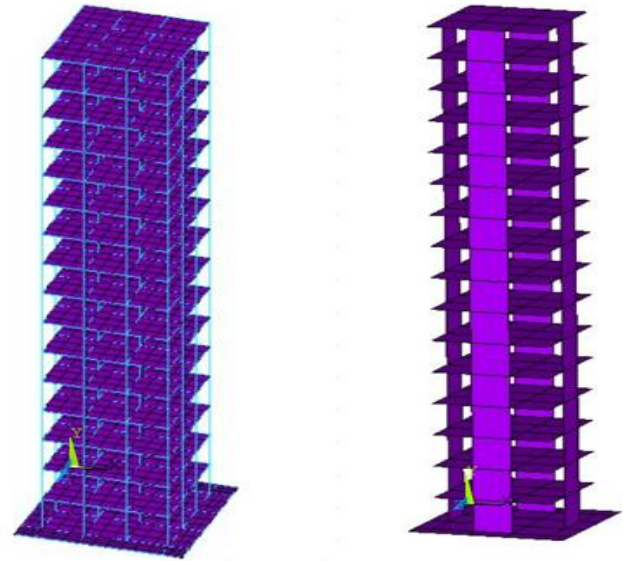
3D View of G+15 Building Without and with Shear Walls Respectively
